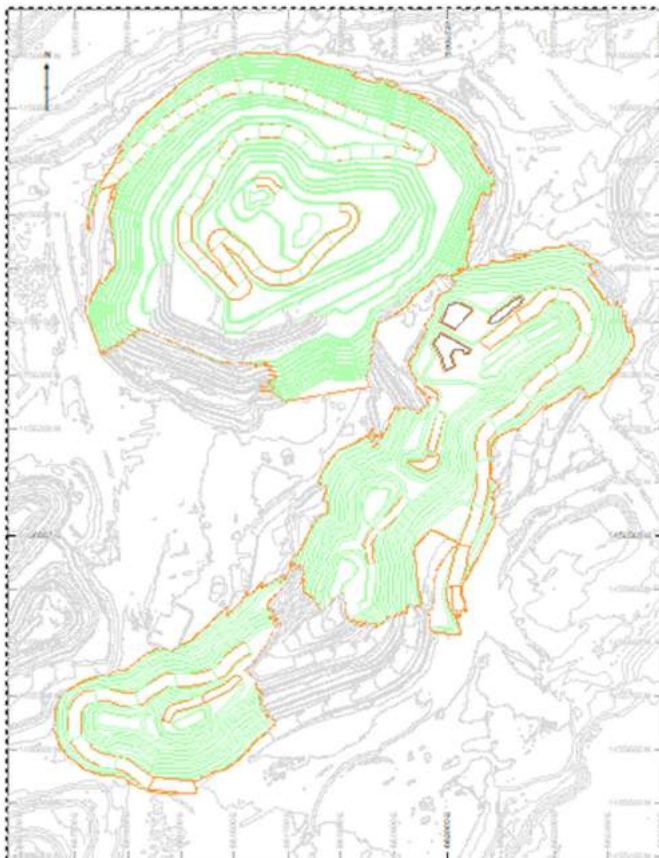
Bissa SW and IOSE Pit Design (Nordgold 2021)
